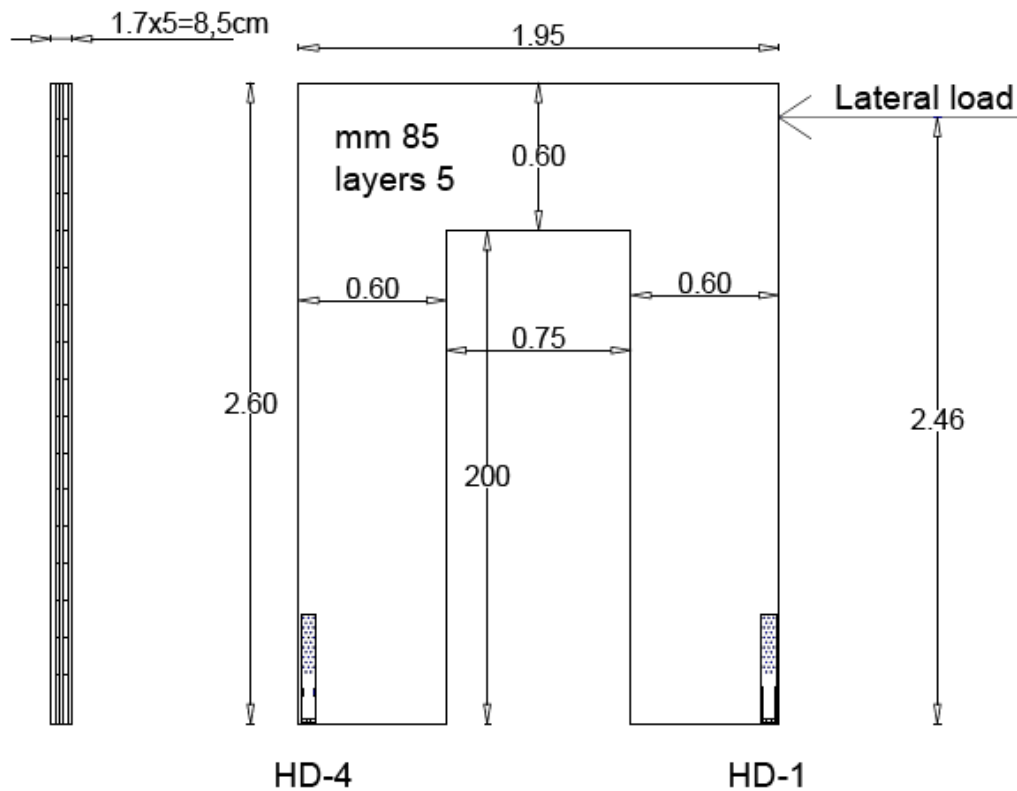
Detailing sketch of geometric configuration and connection system of shearwall 02
